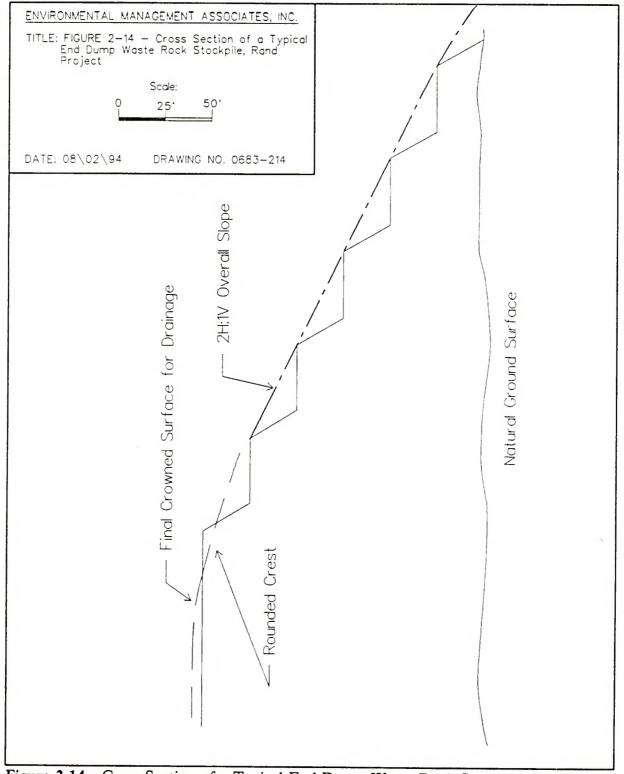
Cross Section of a Typical End-Dump Waste Rock Stockpile, Rand Project
